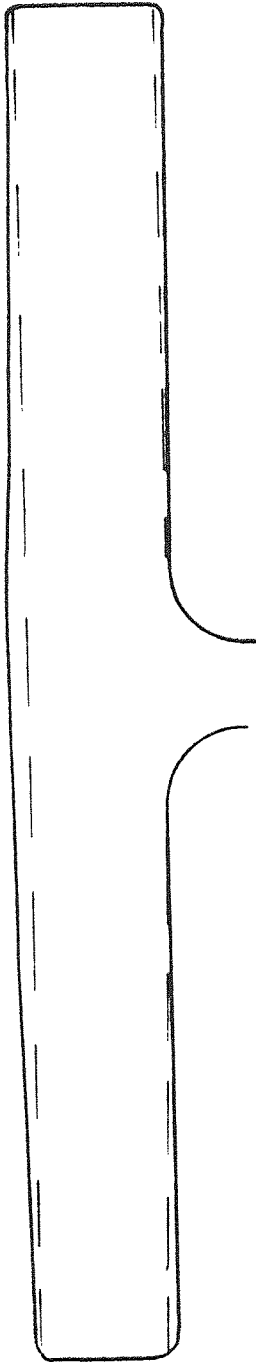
Deformation of Compression Flange/Weld Resulting
